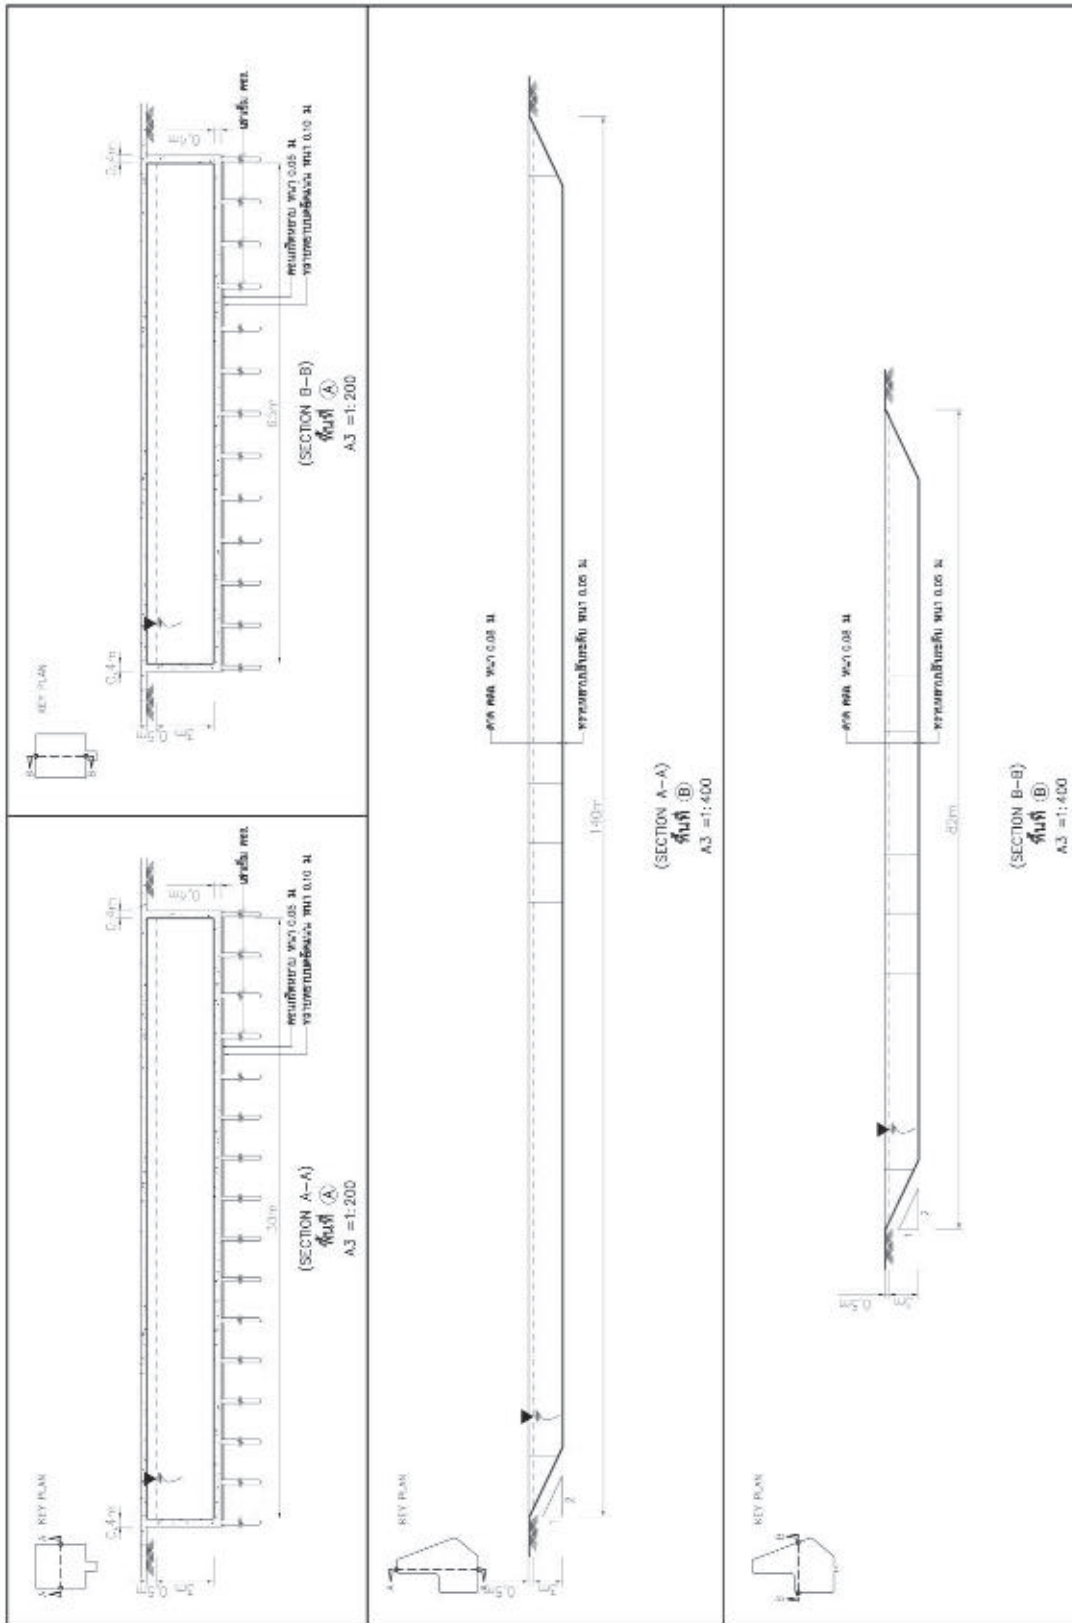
Vertical Cross Section of Retention Ponds
